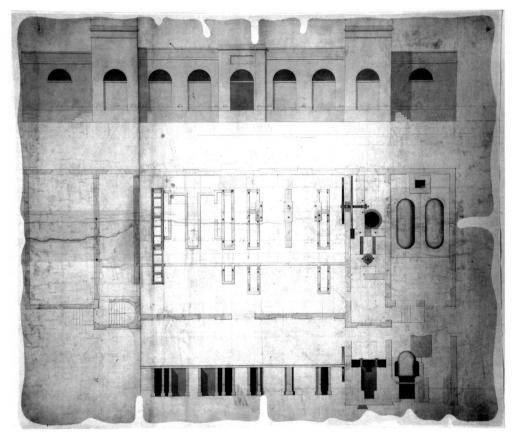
Undated elevation, plan and partial section of a sawmill by M. I. Brunel, thought to relate to his work at Chatham Dockyard, but almost certainly of the building built in 1806–7 at Battersea (TNA, ADM 140/98 (4))
